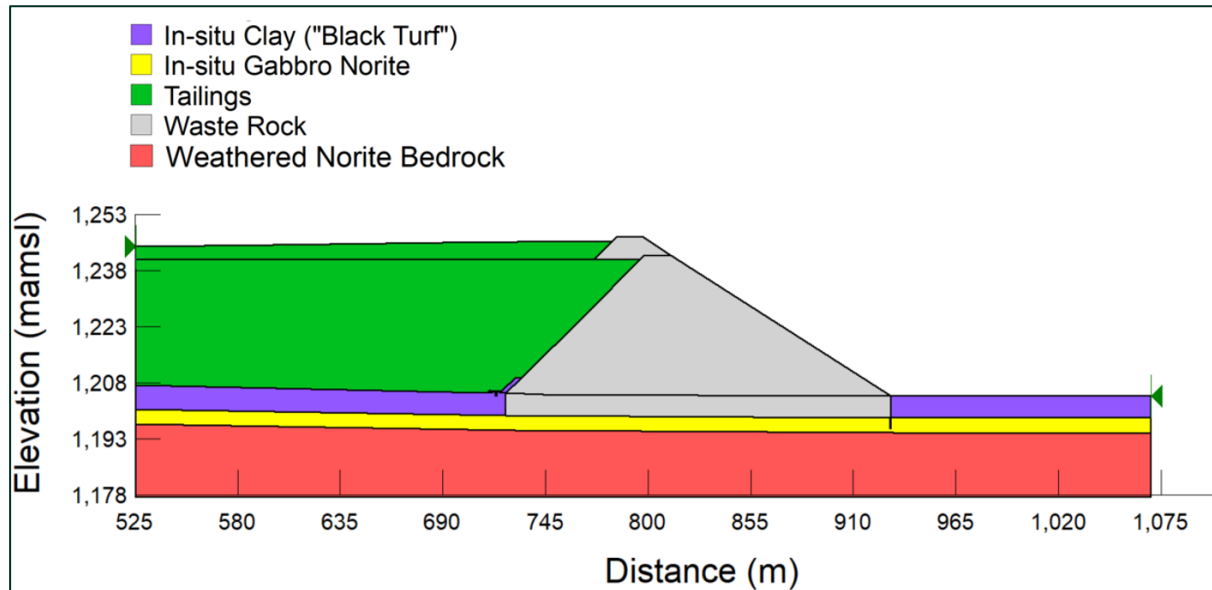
TSF 2 Phase 1 North Embankment (section C-C)
